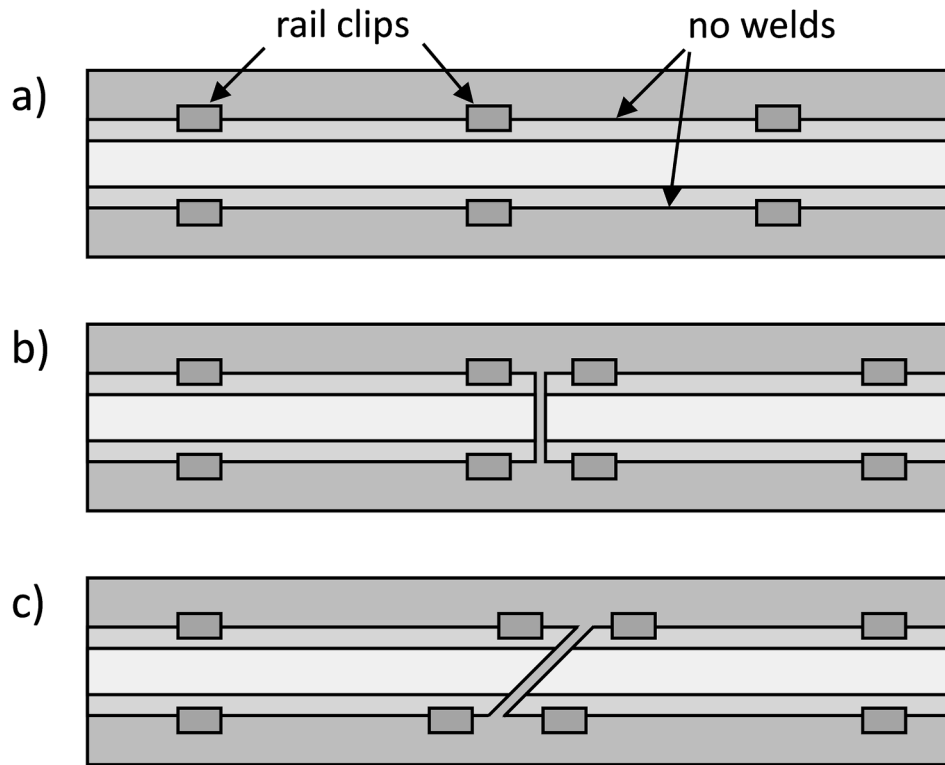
Top view on crane rails with foot flange on girder: a) continuous rail, b) orthogonal joint, c) bevel joint.
